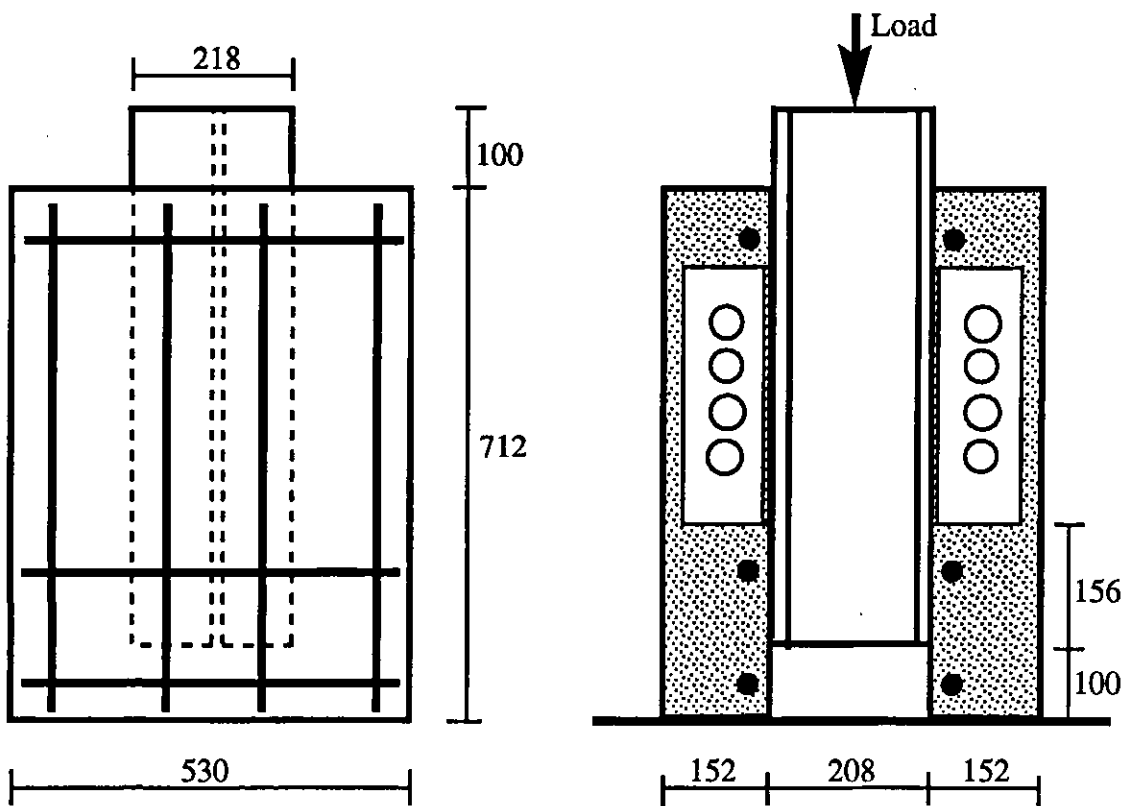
Dimensions of the push-out test specimens (mm)
